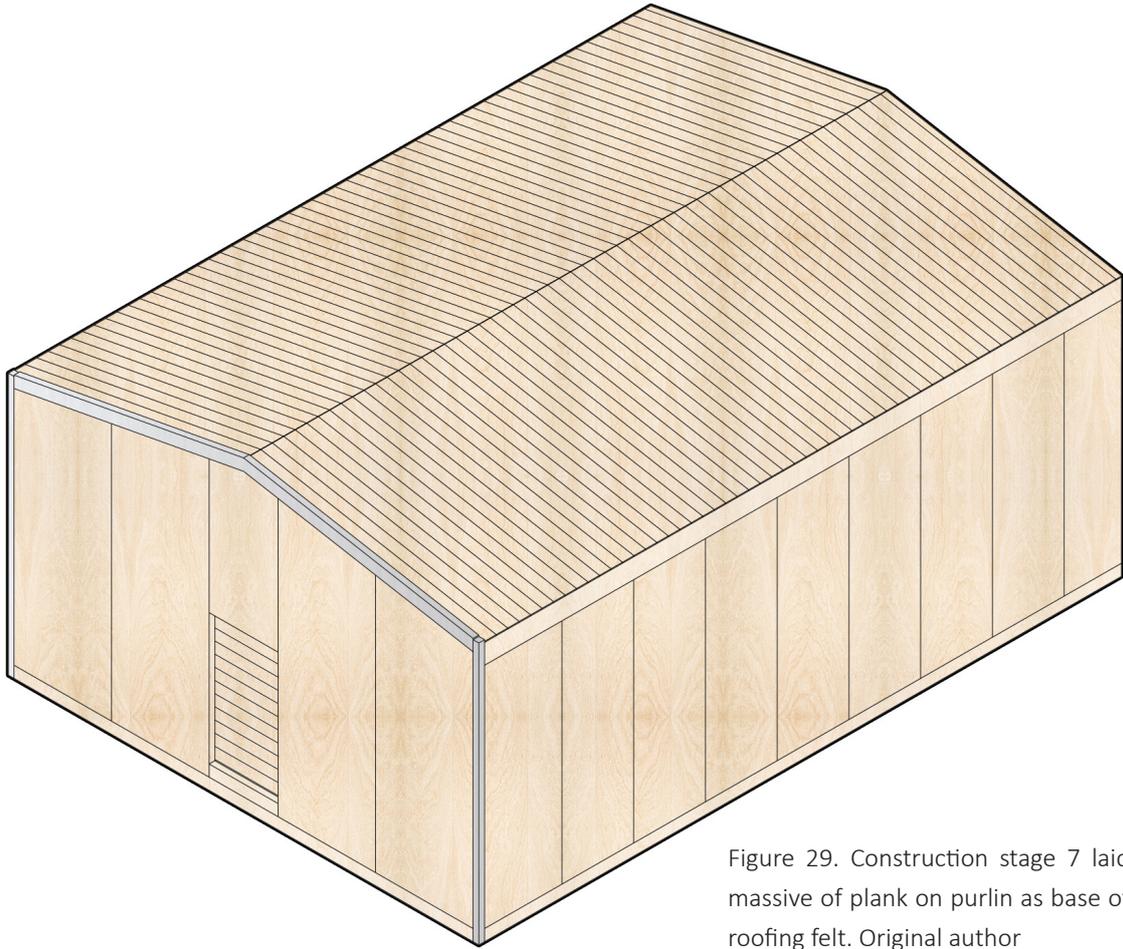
Construction stage 7 laid massive of plank on purlin as base of roofing felt. Original author
